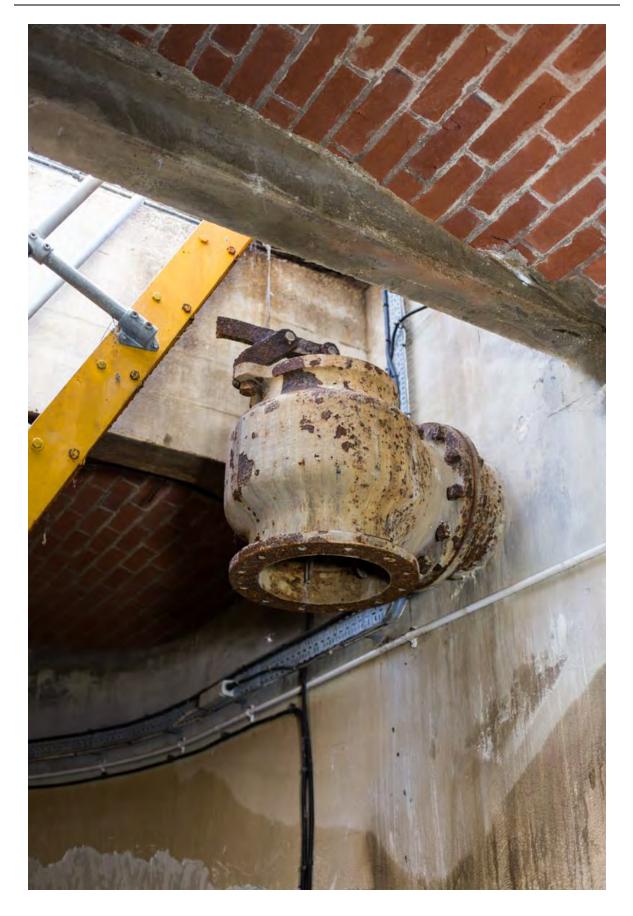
Inlet valve on south-west wall, beneath escape hatch steps
